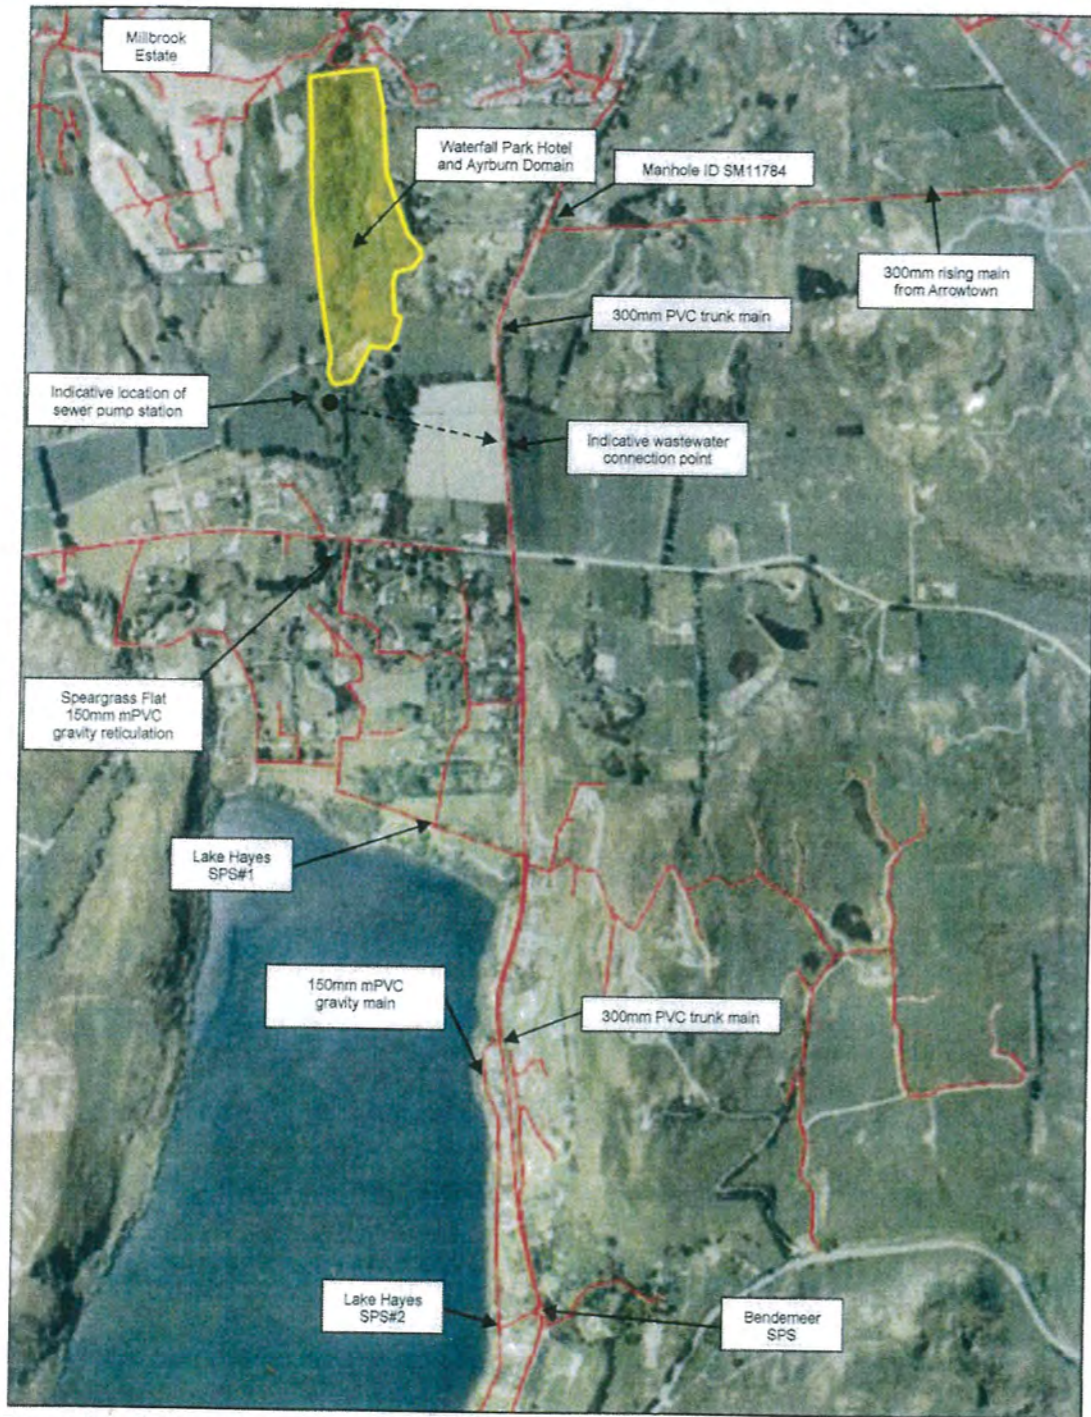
Schematic overview of existing sewer services in the vicinity of the Waterfall Park Development with the potential location of new sewer pump station indicated. The location of the pump station is subject to confirmation during detailed design.
